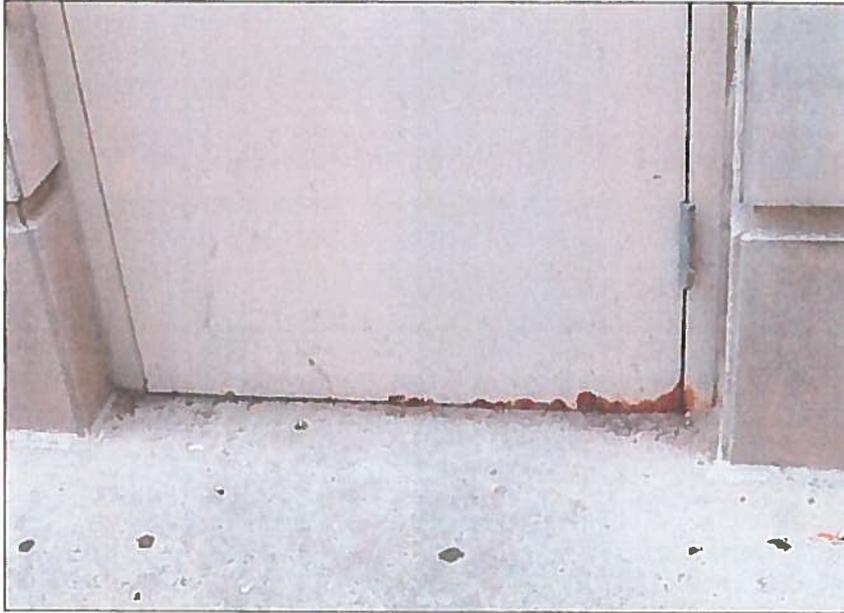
Rusted bottom of hollow metal door and frame (typical all elevations).
